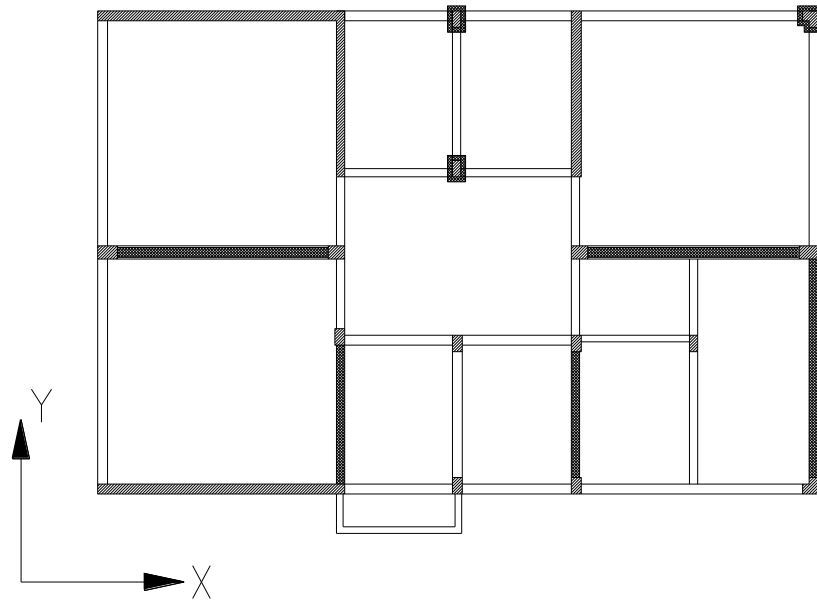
Plan View of the Retrofitted Güngören Haznedar Abdi İpekçi Primary School Block B
